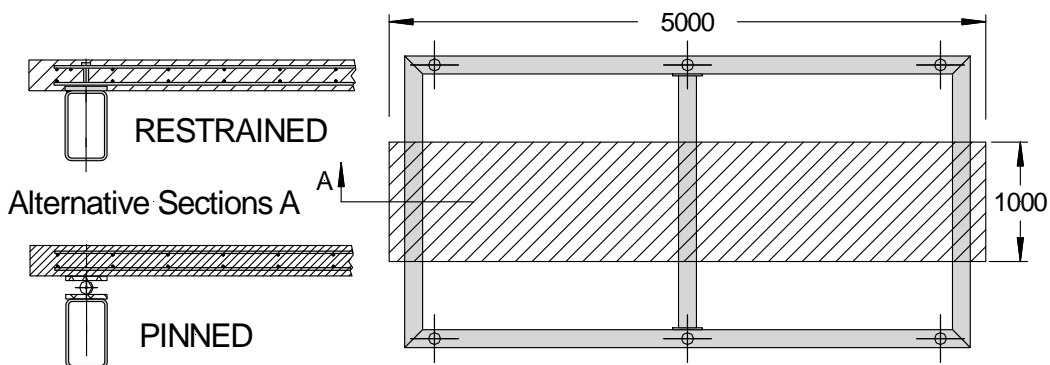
Tubular steel ringbeam universal test rig (two span one-way slab shown)
